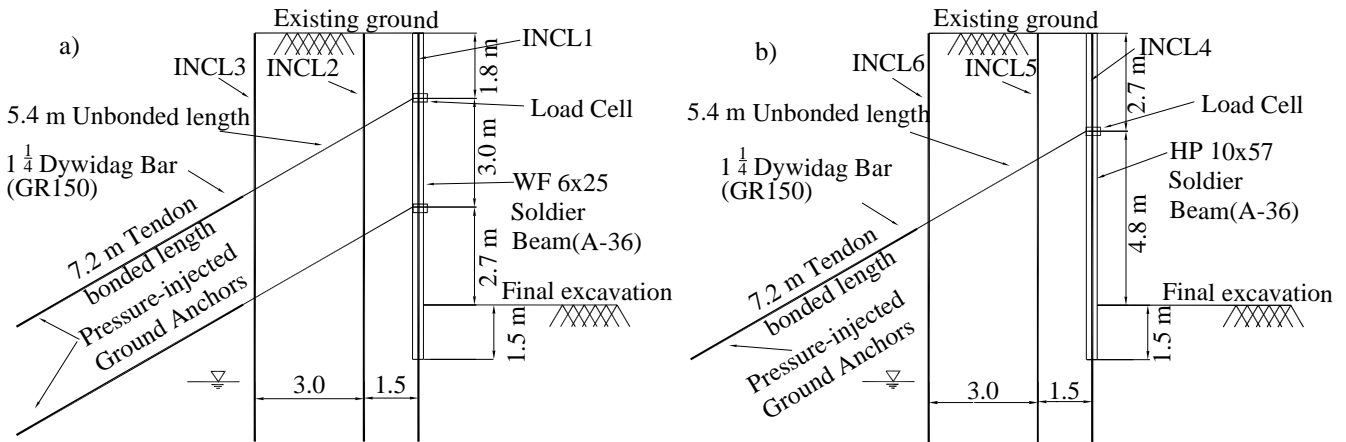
Sections of the wall: a) Two level tieback, b) One level tieback (modified after FHWA-RD-98-066)
